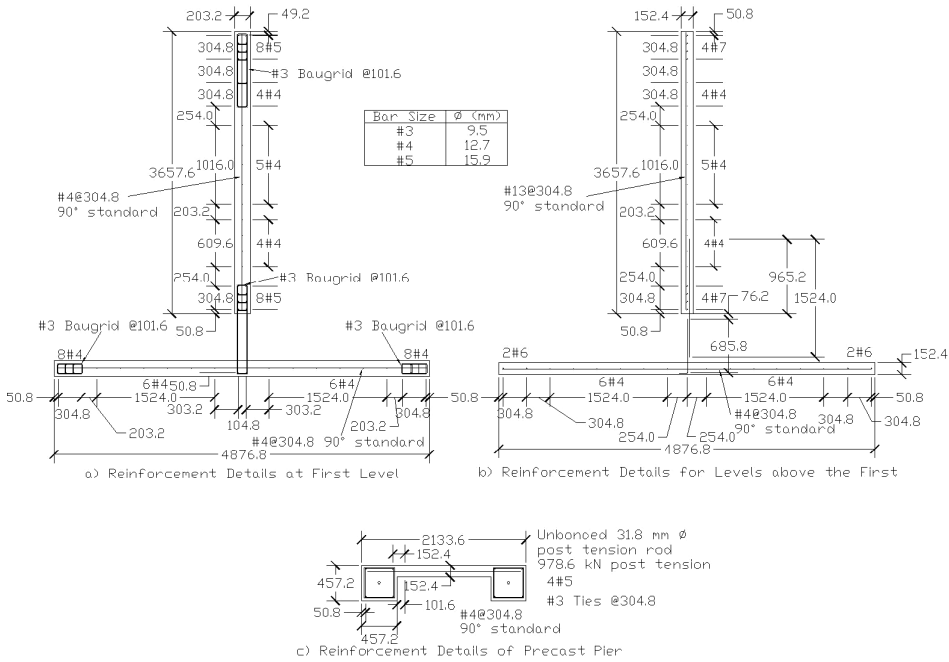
Wall and pier reinforcement details [after NEES7Story, 2006].
